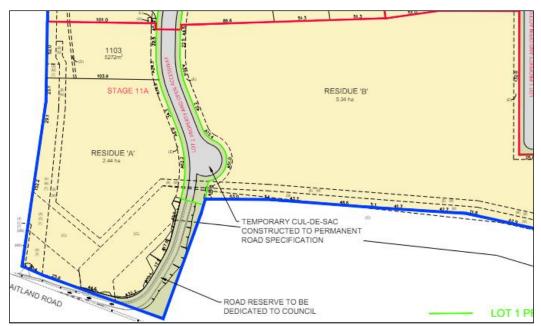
MA2022/00155 plan, displaying road works to be undertaken under a subdivision works certificate.
